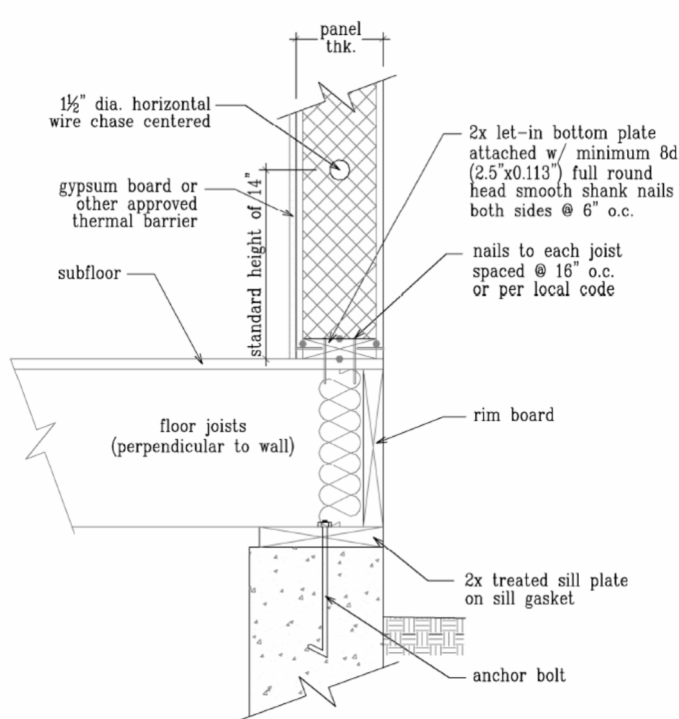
TYPICAL WALL PANEL ON FLOOR
